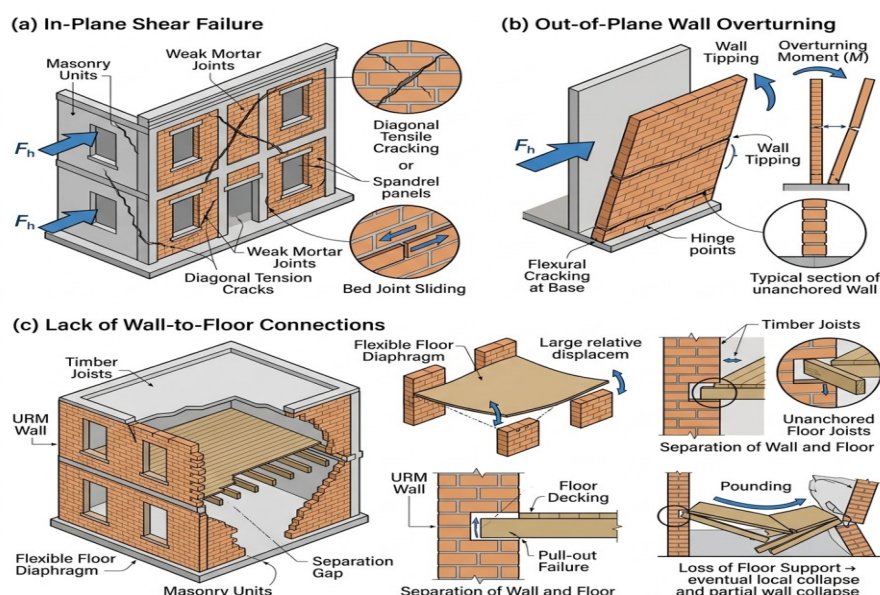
Comprehensive Schematic of Typical Seismic Failure Mechanisms in Historic Unreinforced Masonry Buildings
